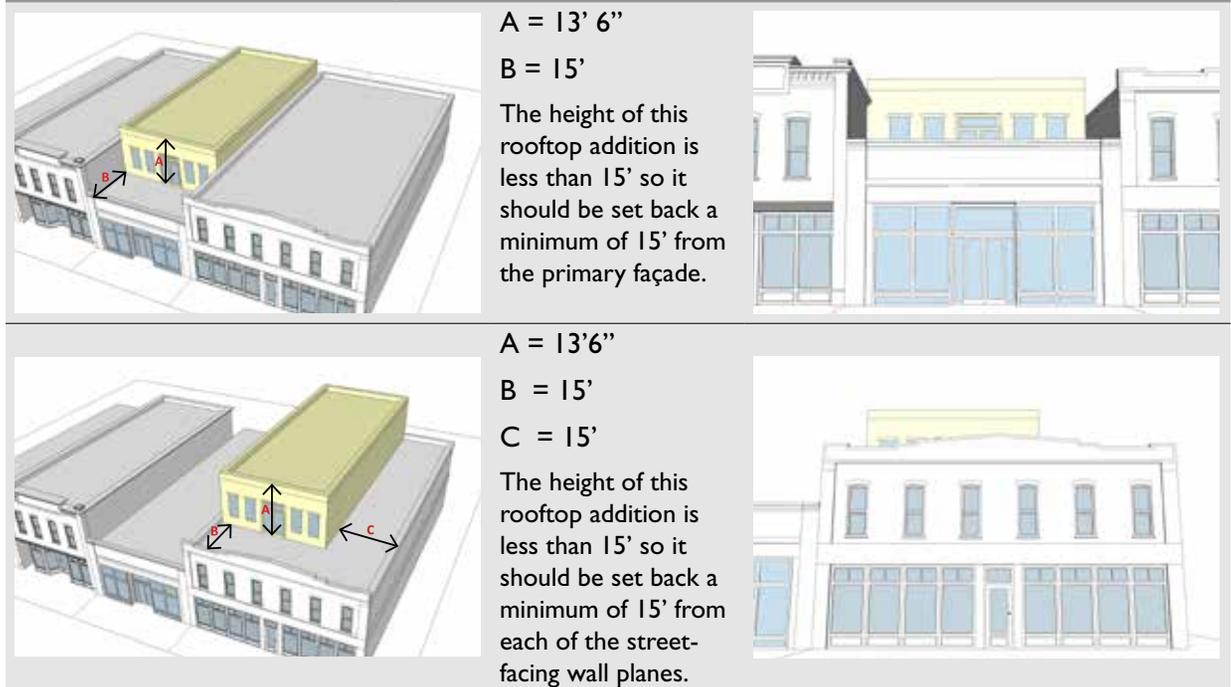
In general, a rooftop addition on a historic building should be set back from the primary façade by a dimension that is equivalent to the height of the addition, or fifteen feet, whichever is greater. A rooftop addition on a historic building that is located on a corner should be set back from the primary façade by a dimension that is equivalent to the height of the addition, or fifteen feet, whichever is greater; and should be set back from other street-facing wall planes by a dimension that is equivalent to half of the height of the addition, or fifteen feet, whichever is greater.
